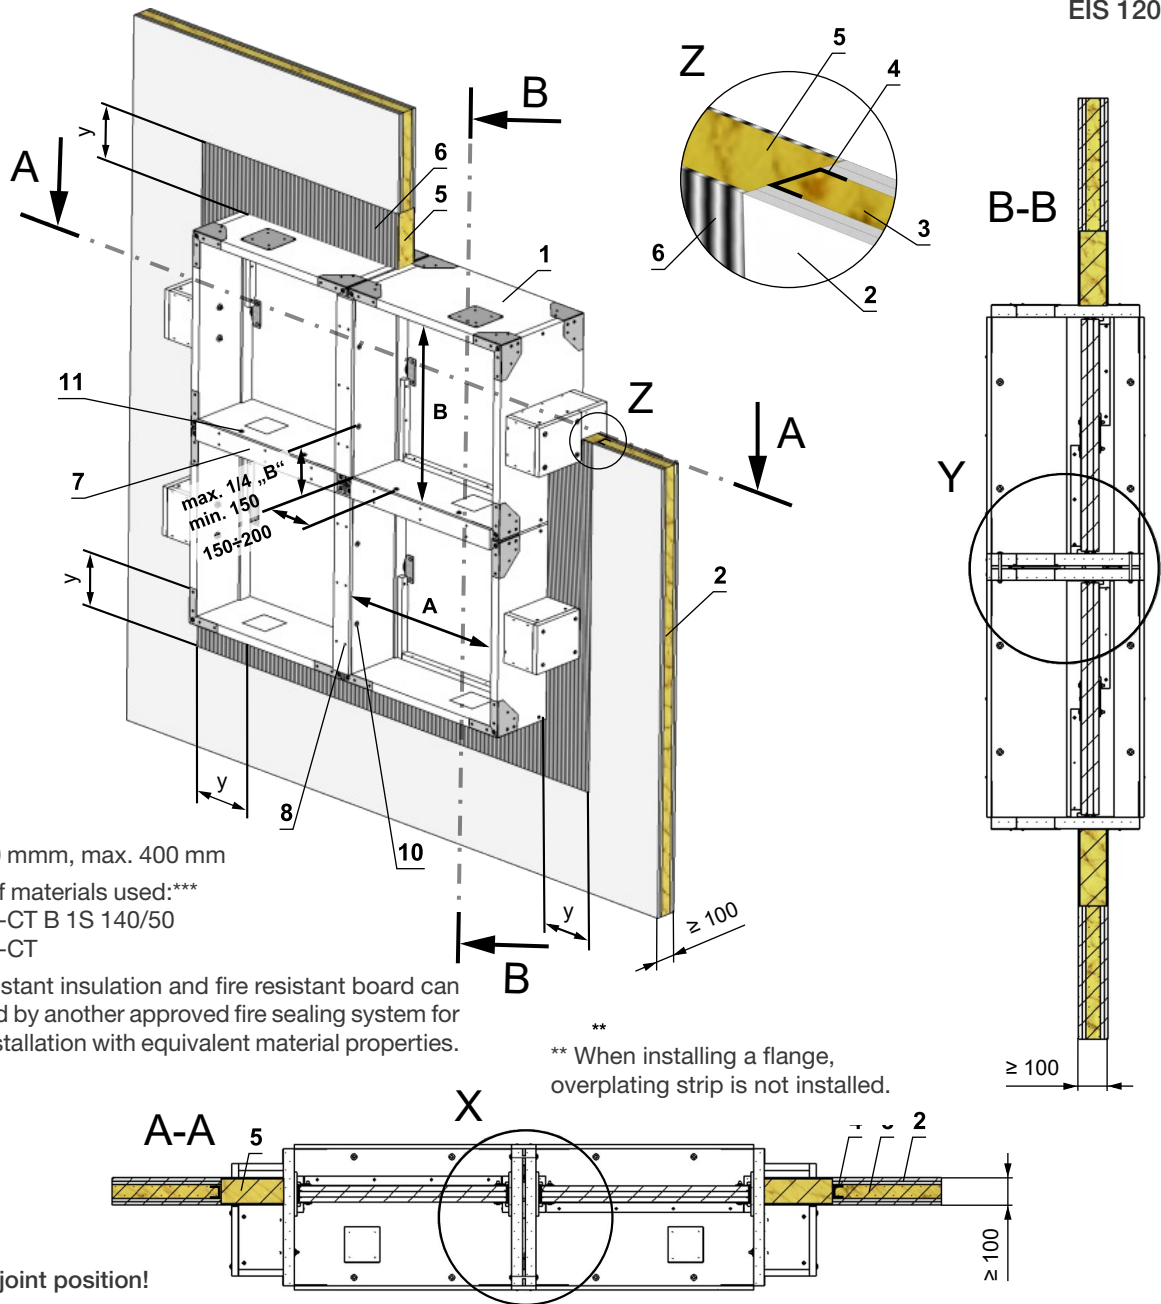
4 dampers - gypsum wall construction - Weichschott (Ablative Coated Batt)
